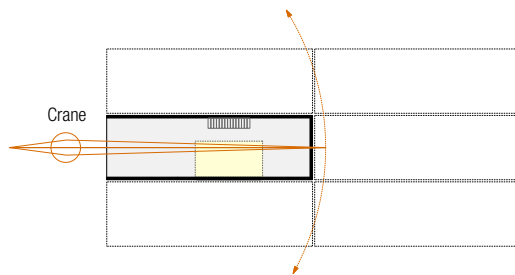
Typical construction site situation of a compact courtyard house in schematic representation.
